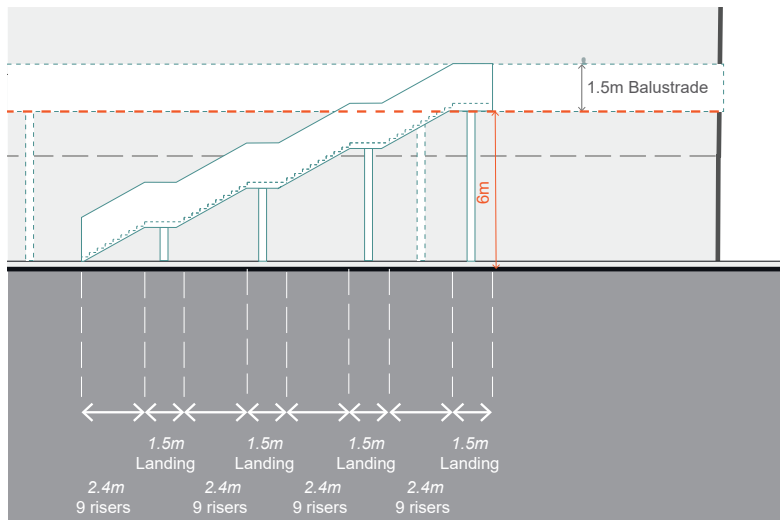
6m Height Stair, Elevation (typical plan see section 7-1 fig.14)
